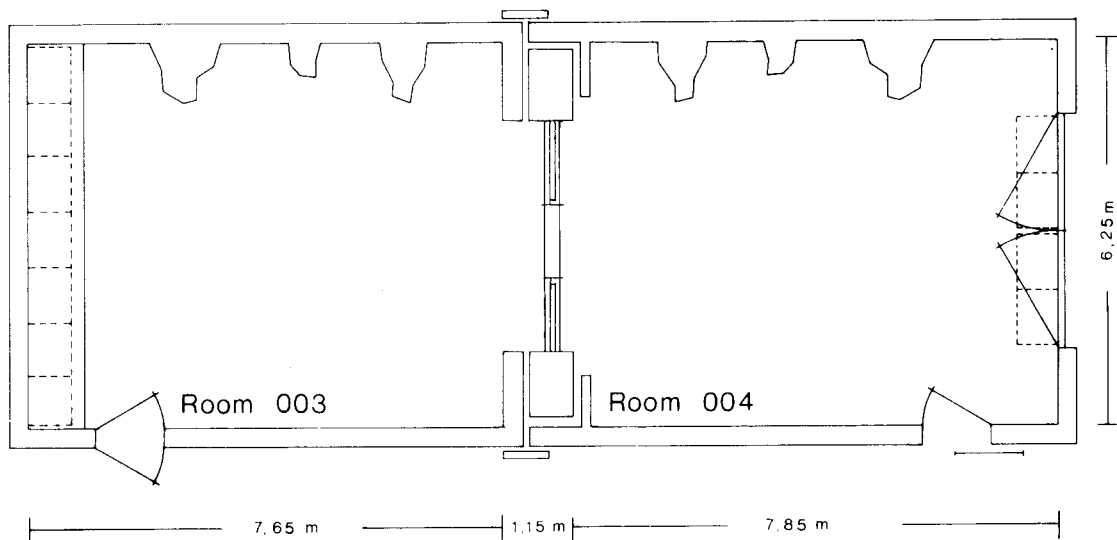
Horizontal section of the reverberant rooms at the Technical University of Denmark
